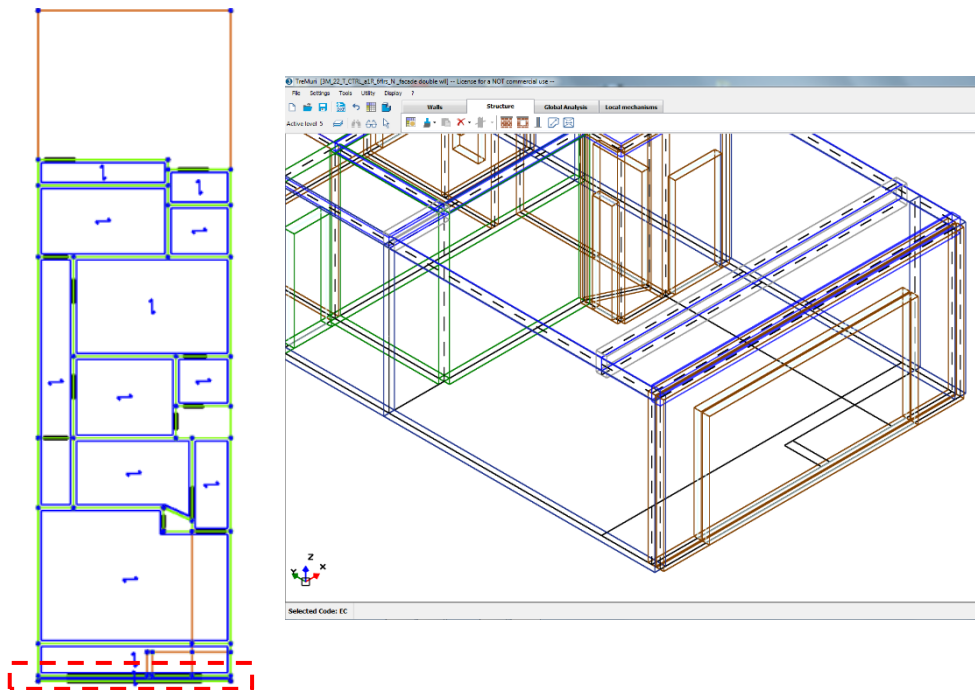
Front facade modelled as two 153 mm thick hollow concrete blockwork walls defined 25 mm apart and slabbed over, at every slab level, by a 300 mm thick reinforced concrete slab: Typical floor plan and 3-dimensional view of 3Muri® numerical model in area of front facade.
